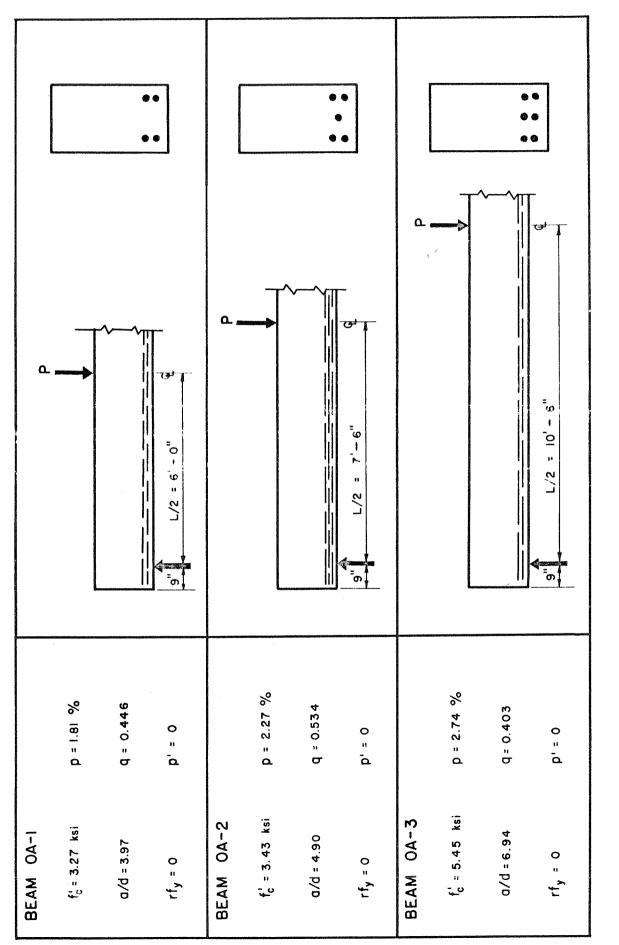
A SERIES OA - BEAM ELEVATIONS
